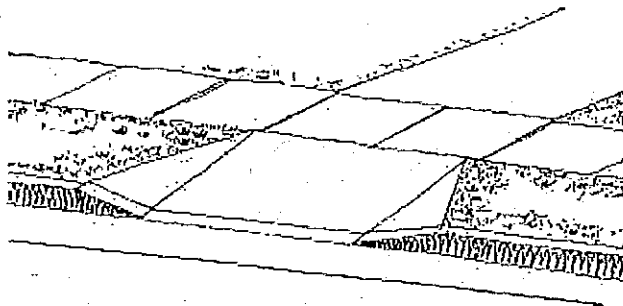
When sidewalks have a planter strip, the ramp of the driveway does not interfere with a pedestrian's path of travel.
